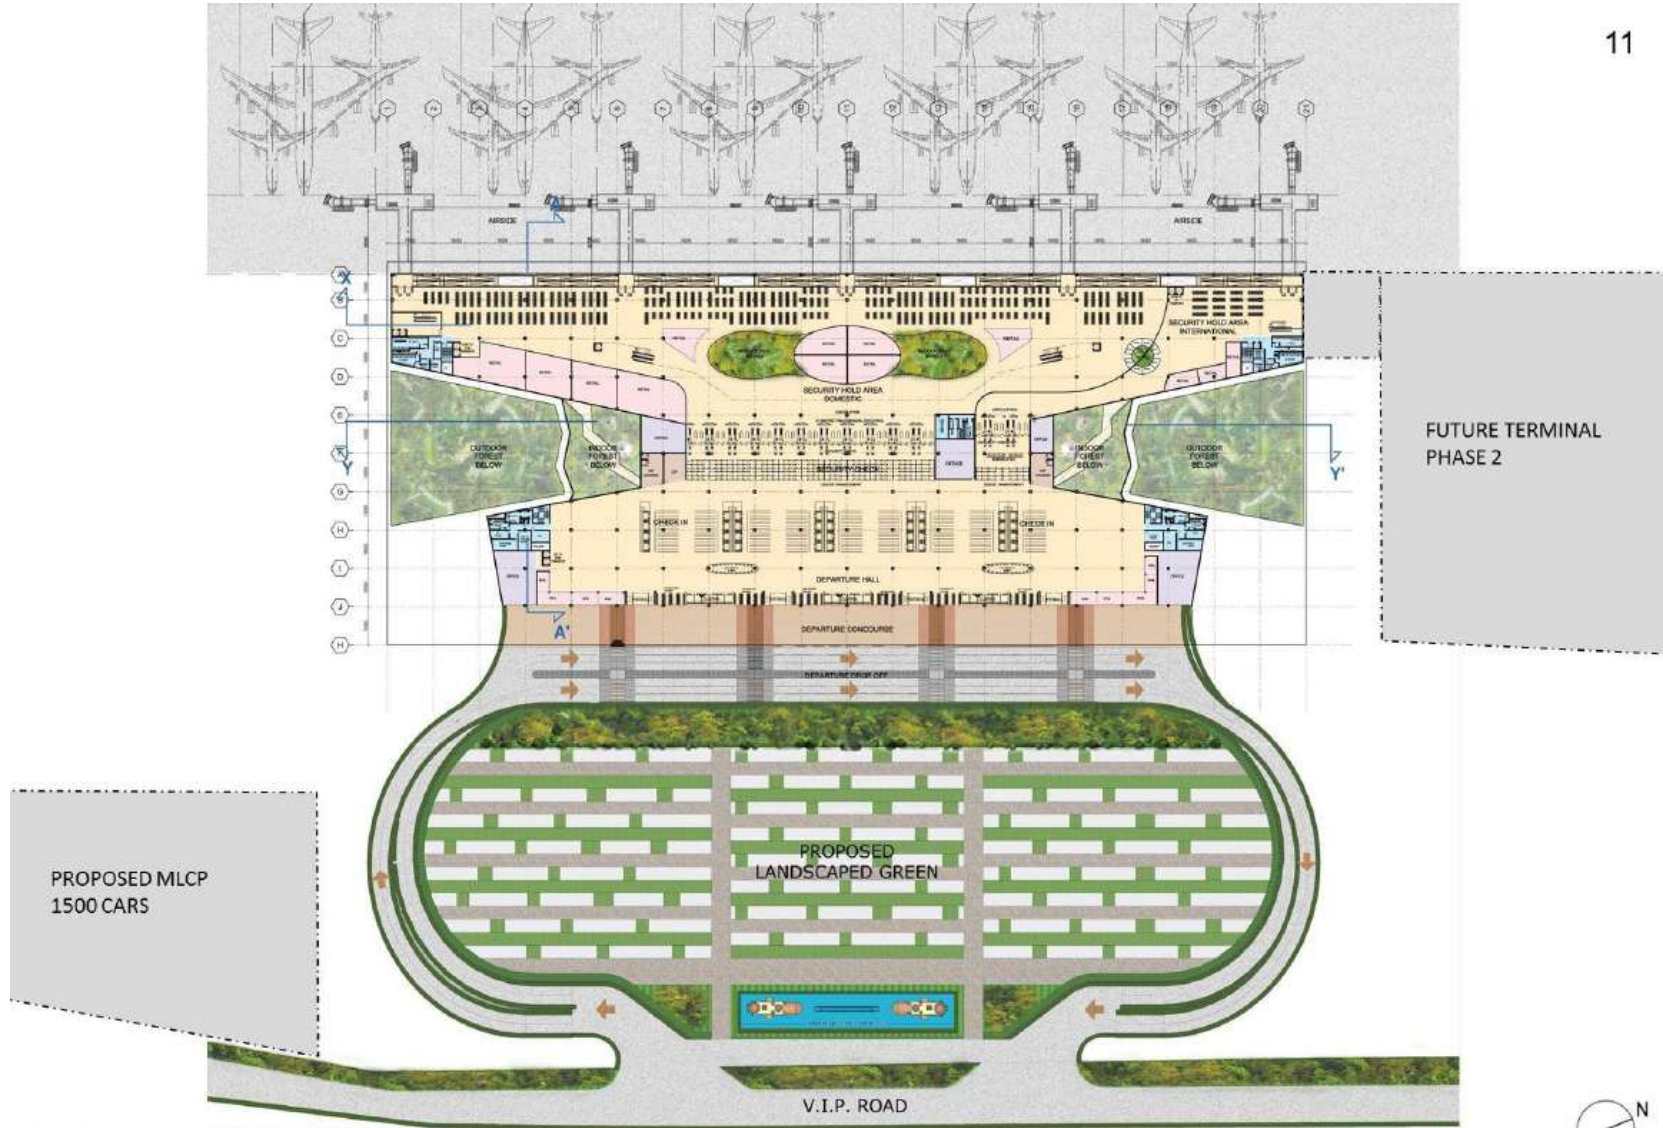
Site Plan for Departure Side for New Integrated Terminal Building
